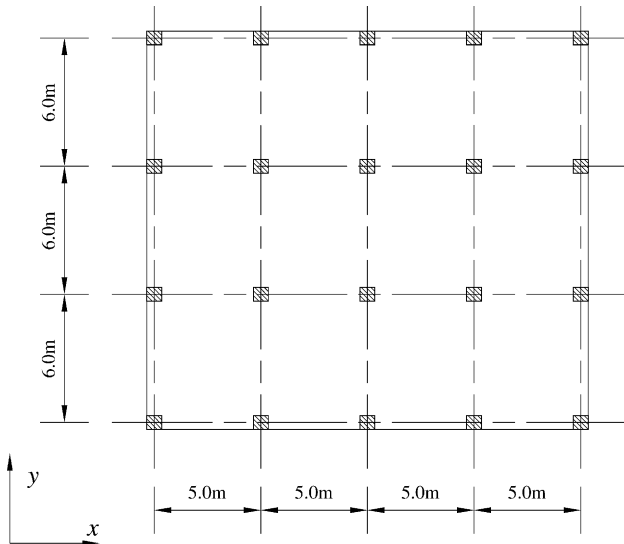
A plan of the flat slab building in Examples 1 and 2.
